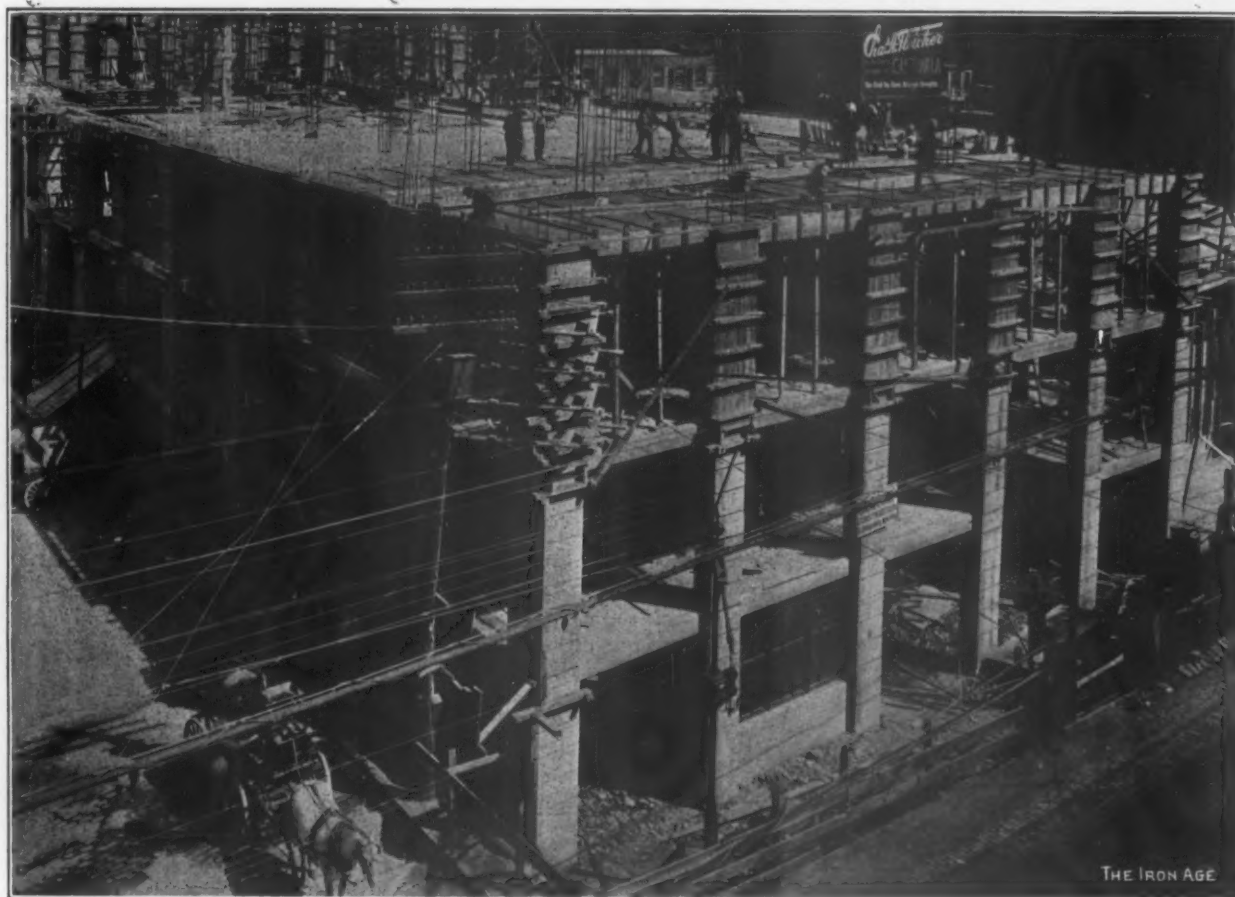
The Building Completed Up to the Fourth Floor and Forms Erected for the Fifth Floor Columns.
